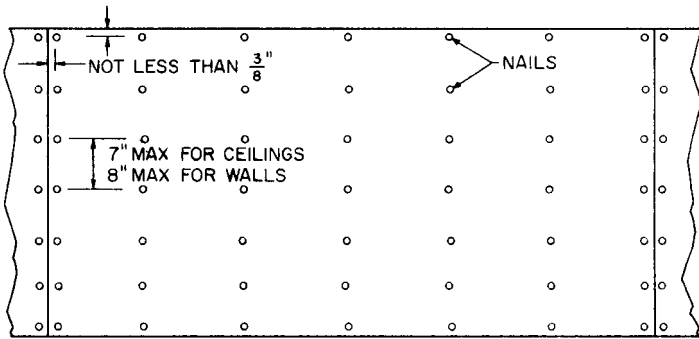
Wallboard attached to wood framing with single nailing.
